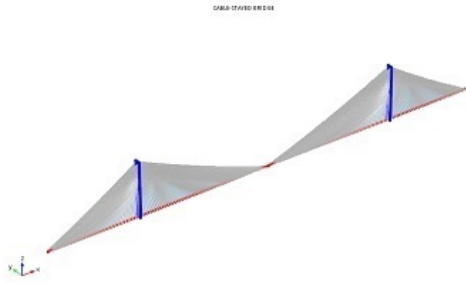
Cable-Stayed Bridge: COMSOL finite element model.
